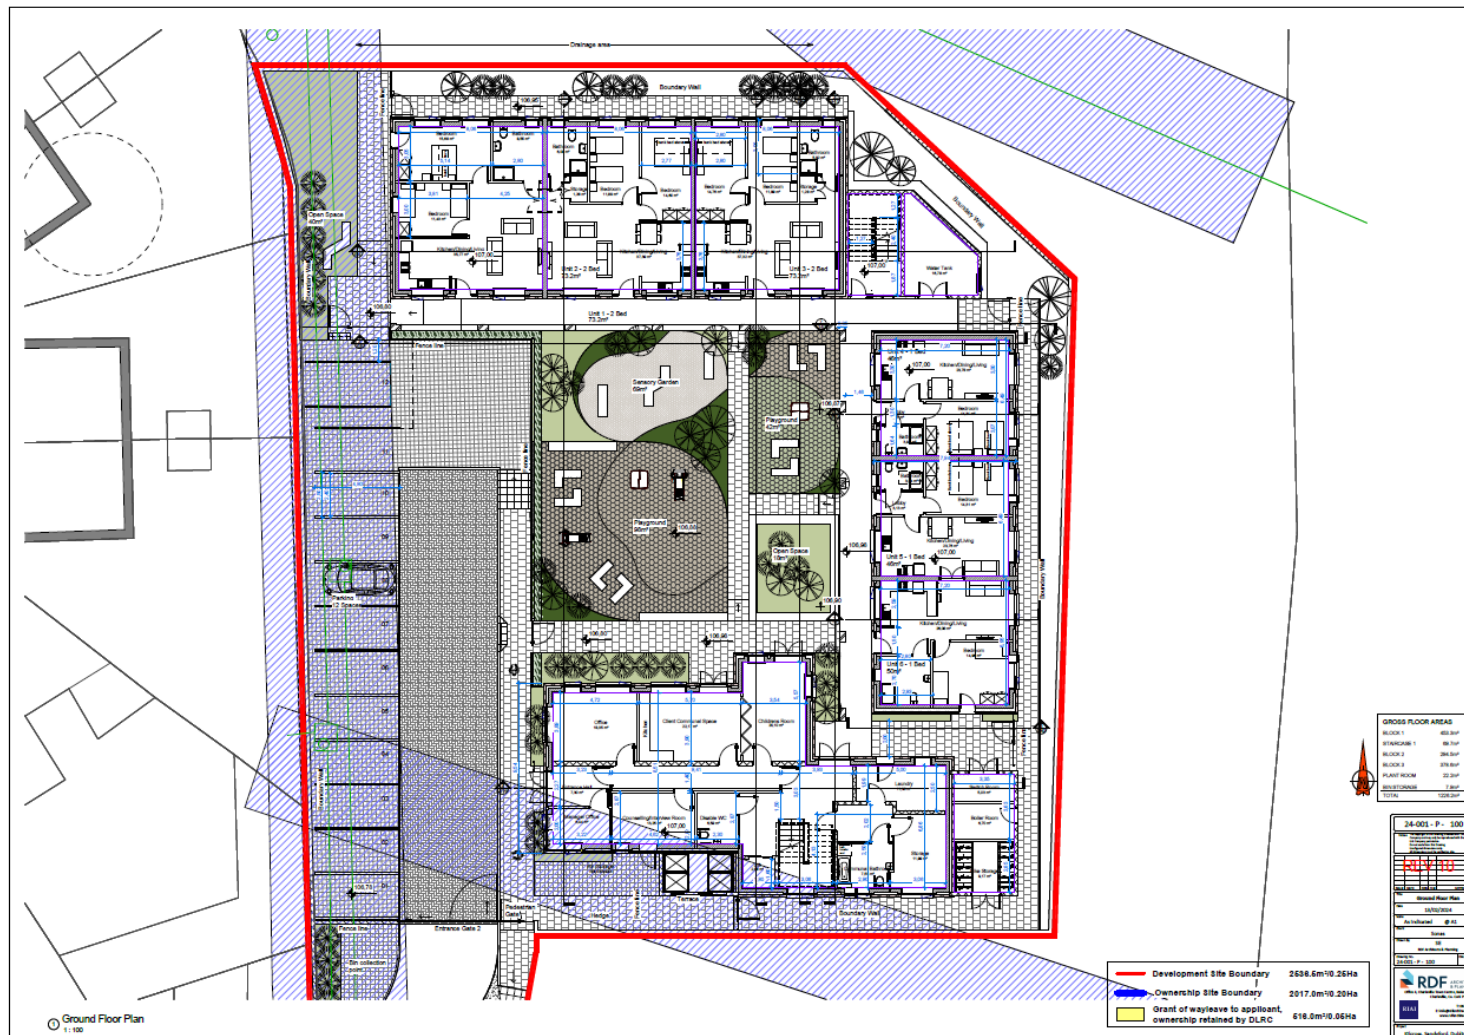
PROPOSED SITE LAYOUT (RDF ARCHITECTURE DRG No: 24-001-P-010).
